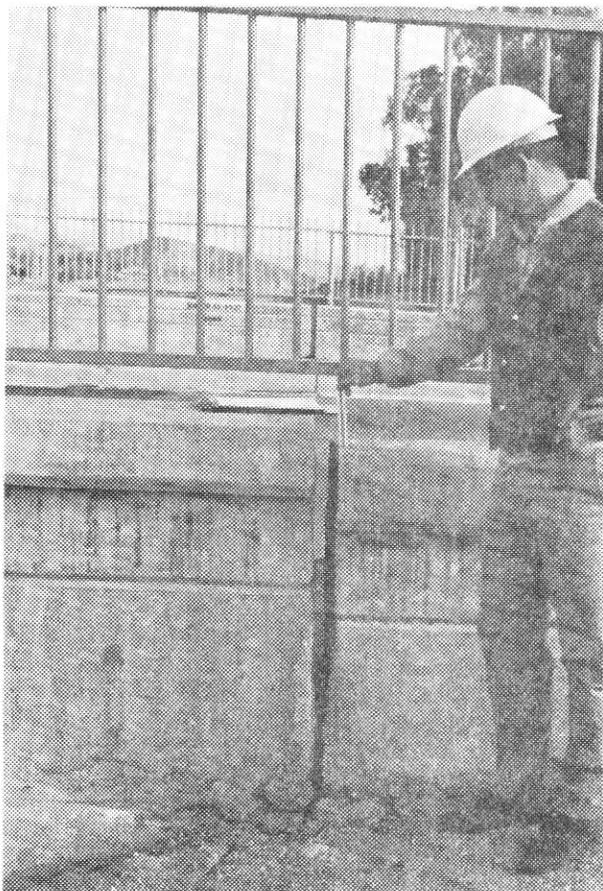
Settlement and separation of wingwall at the Sayre Street Overcrossing.
